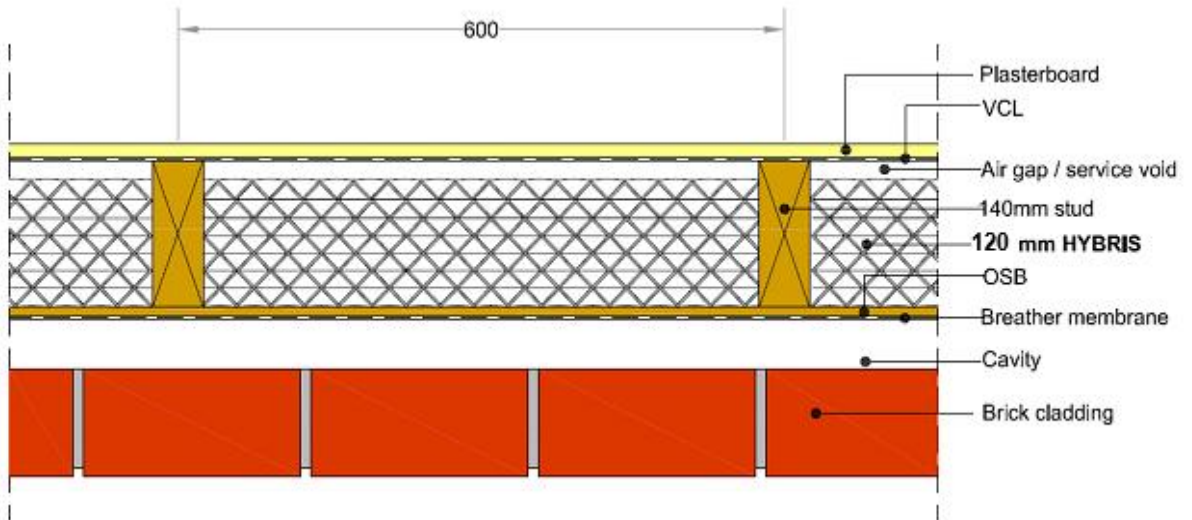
Typical HYBRIS installation in timber-framed wall construction
